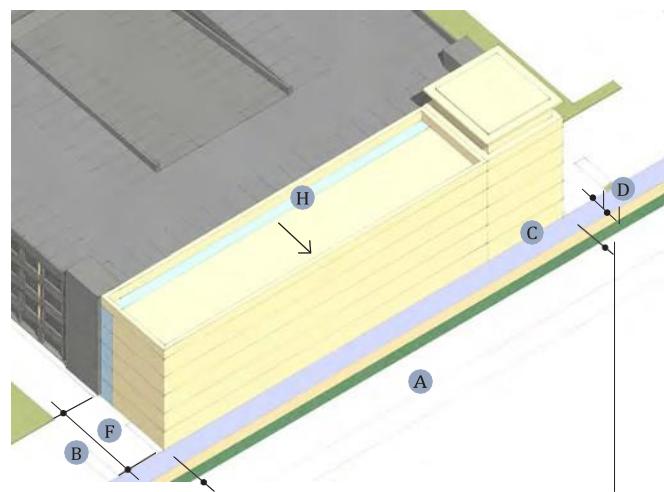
Example of Liner Corridor Multiple-Family Building
